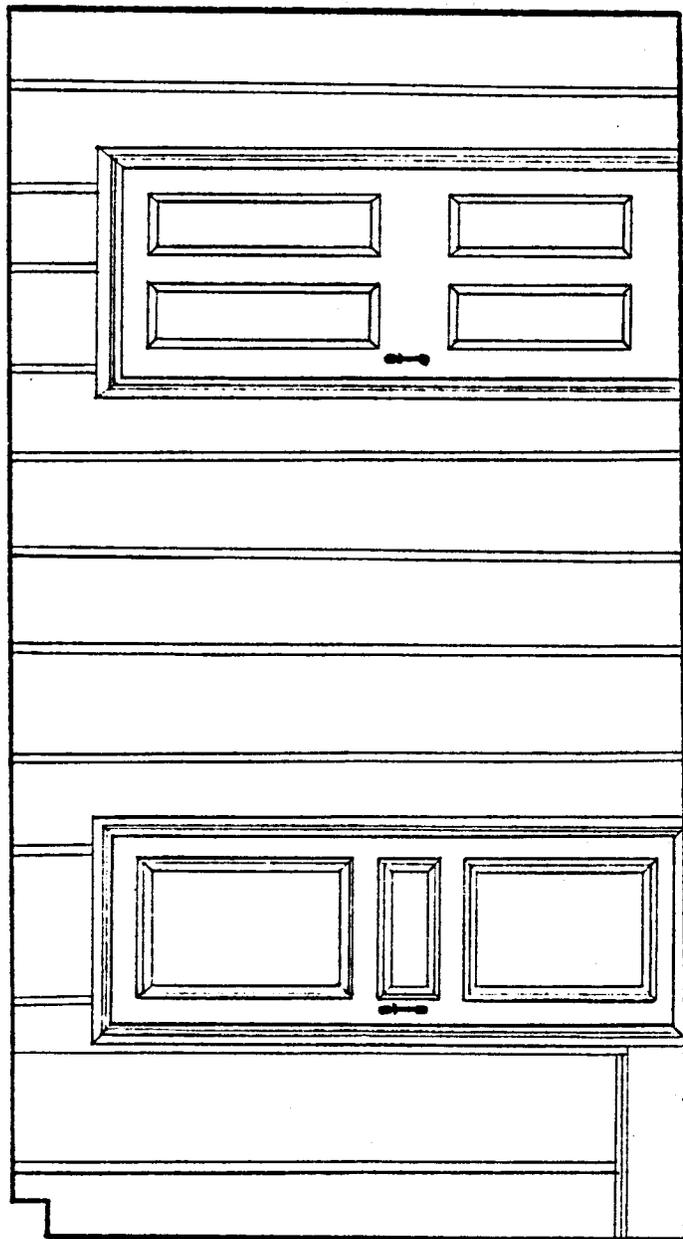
Atwood-Higgins House: East Kitchen, East Wall.
